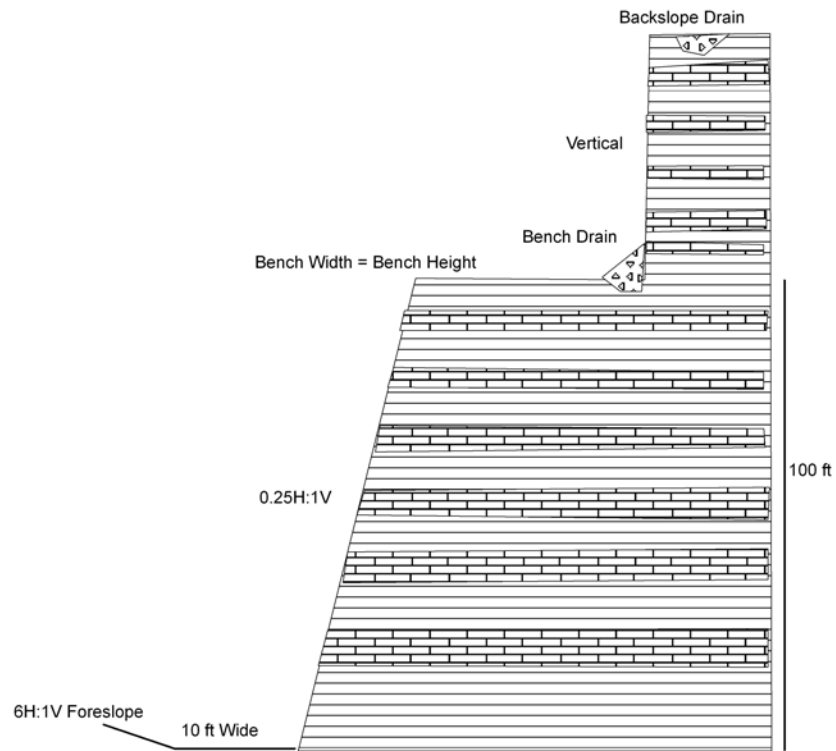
Recommended slope design for Type C stratigraphic configuration of inter-layered design units, case 1. The bench height shown in the figure is for a situation where a 10 ft (3 m) high fence is used.
